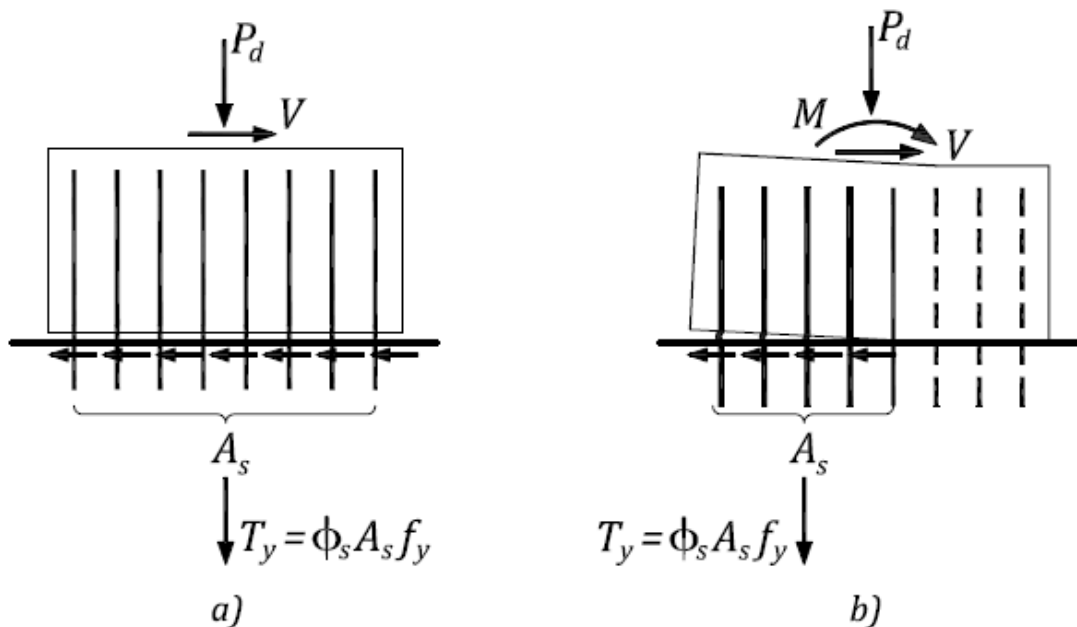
In-plane sliding shear resistance in masonry shear walls: a) conventional construction and limited ductility walls; b) moderately ductile walls.
